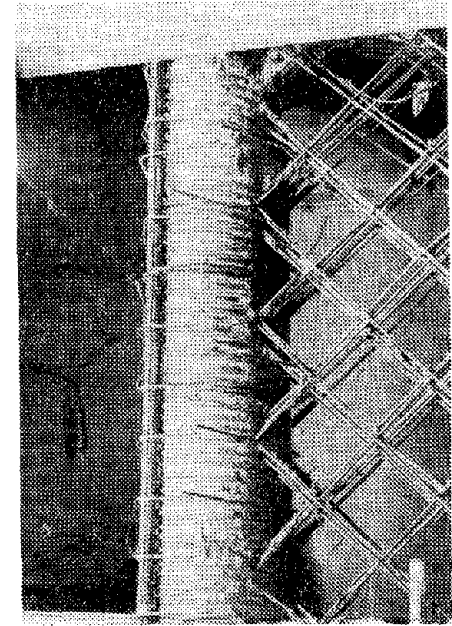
REPAIRING AND STRENGTHENING TECHNIQUES FOR SPECIMENS SW7 AND SW8. (TWO NO. 9 BARS BUTT WELDED ON OUTER EDGES AT BASE OF FIRST-STORY COLUMNS; BARS EXTEND TO FIRST-FLOOR SLAB)
